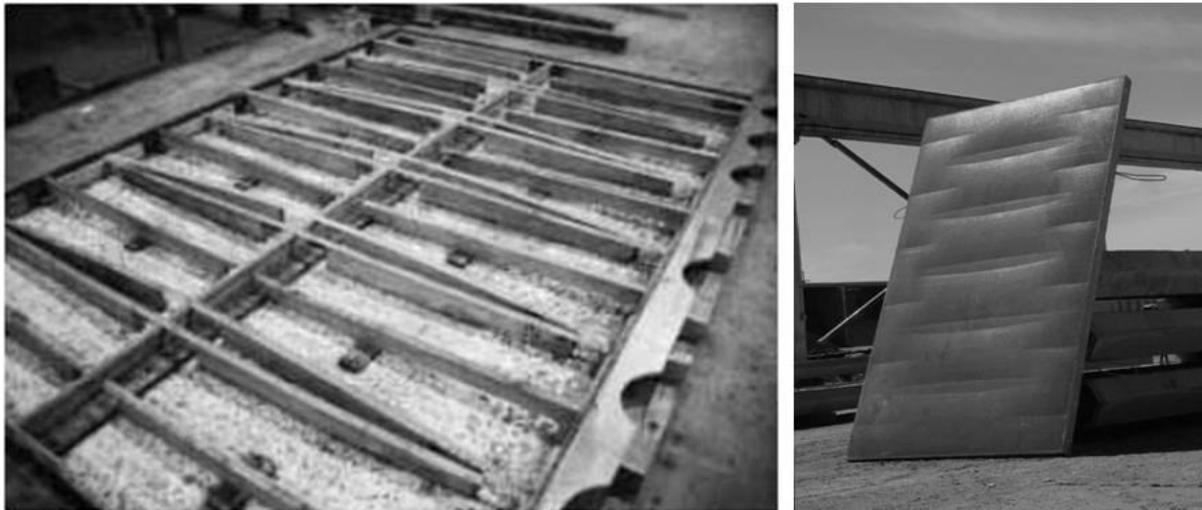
Full-scale formwork and completed concrete panel (C.A.S.T. photos)
